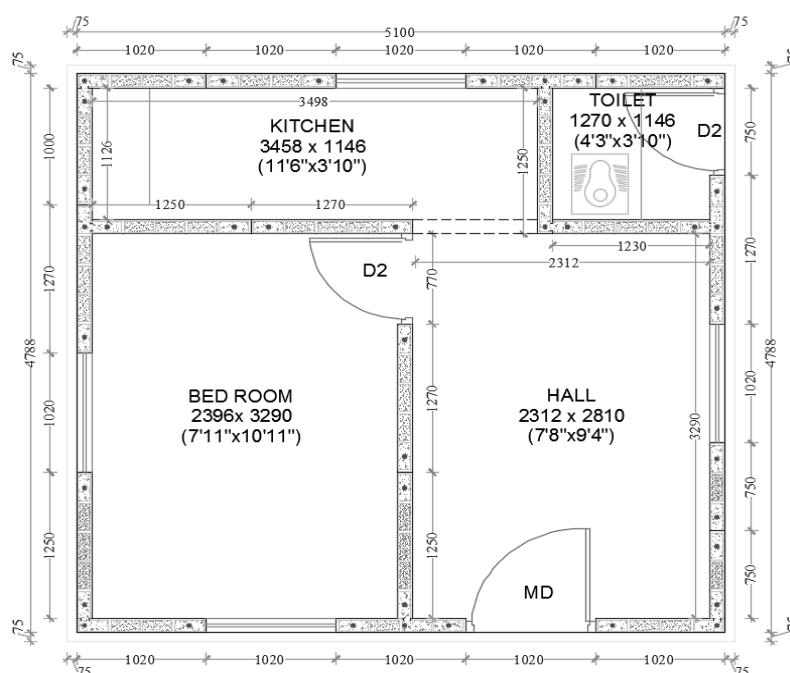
Typical building plan for rural housing with 25 sq.m. plinth area
